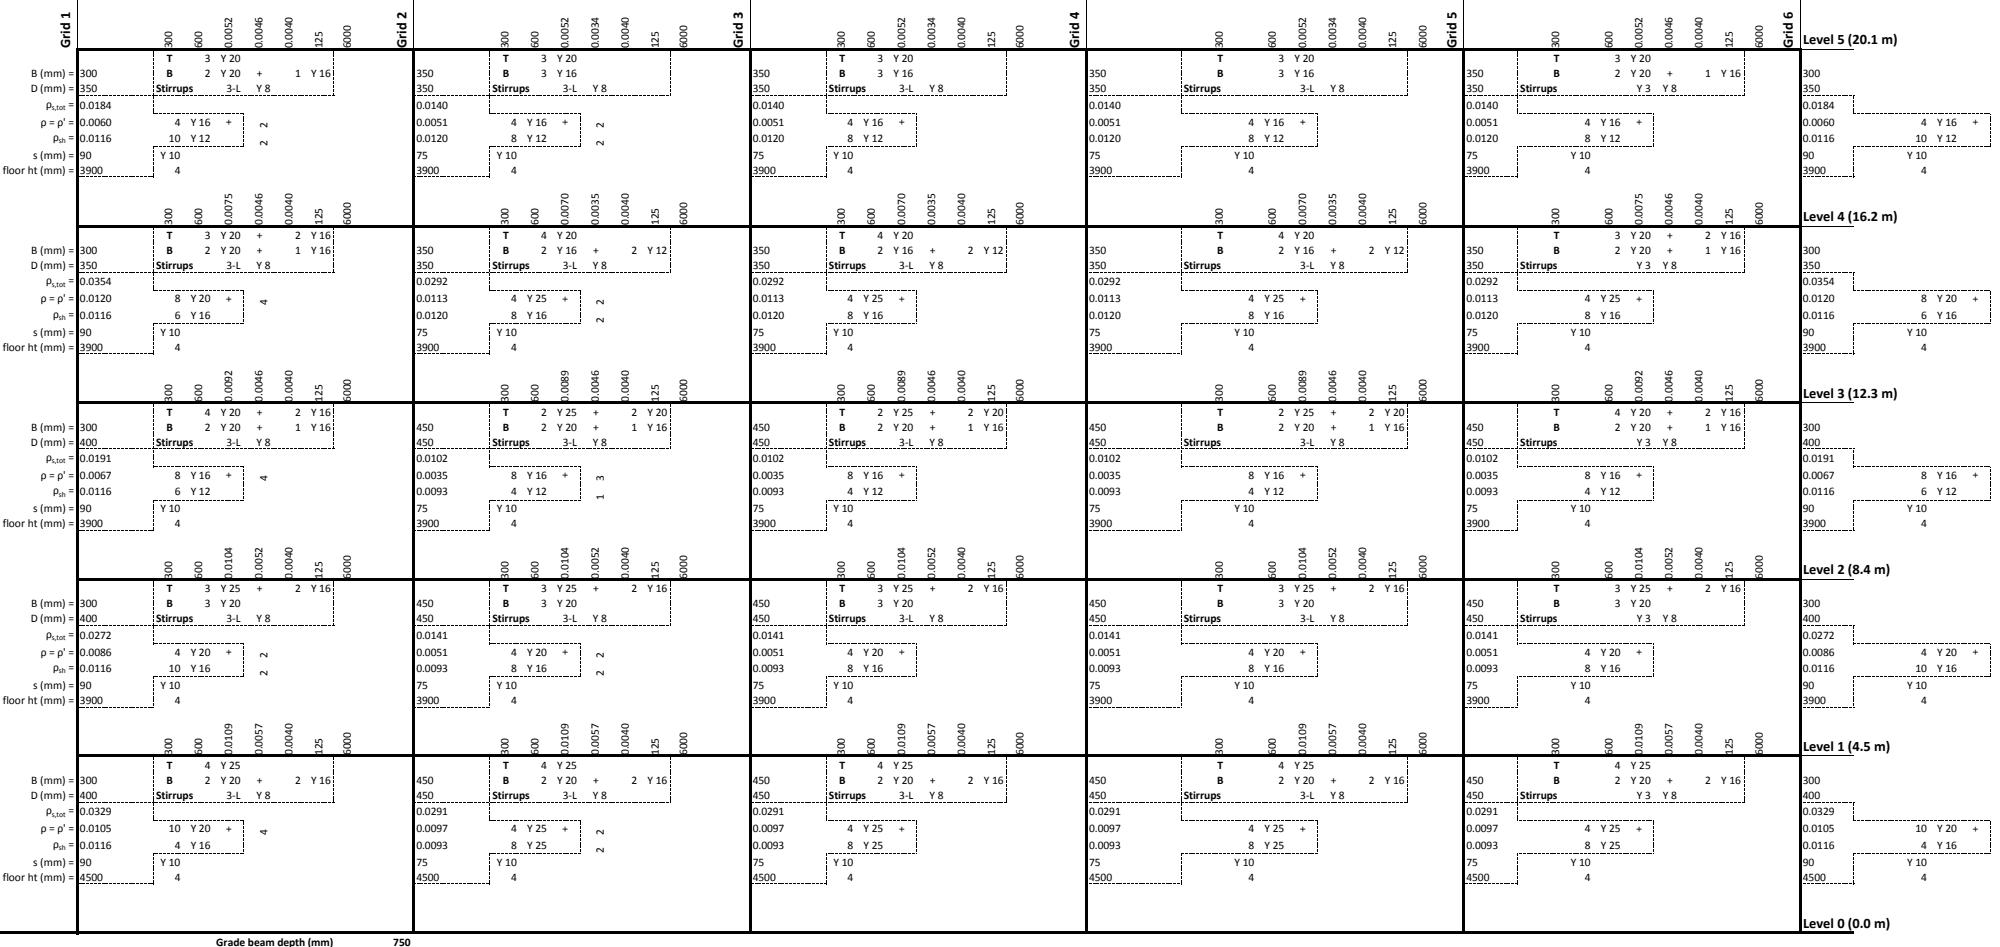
Provided reinforcement and modeling details for building ID 2445
